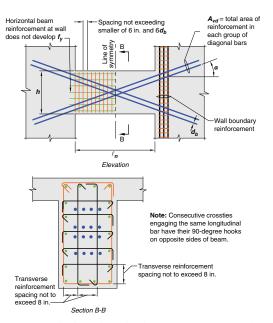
Full confinement of diagonally reinforced concrete beam section in coupling beams with diagonally oriented reinforcement. Wall boundary reinforcement shown on one side only for clarity.
